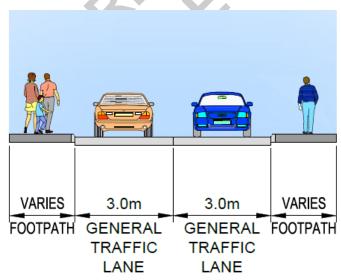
Section 1, Proposed Option 5 - Cross Section B-B
